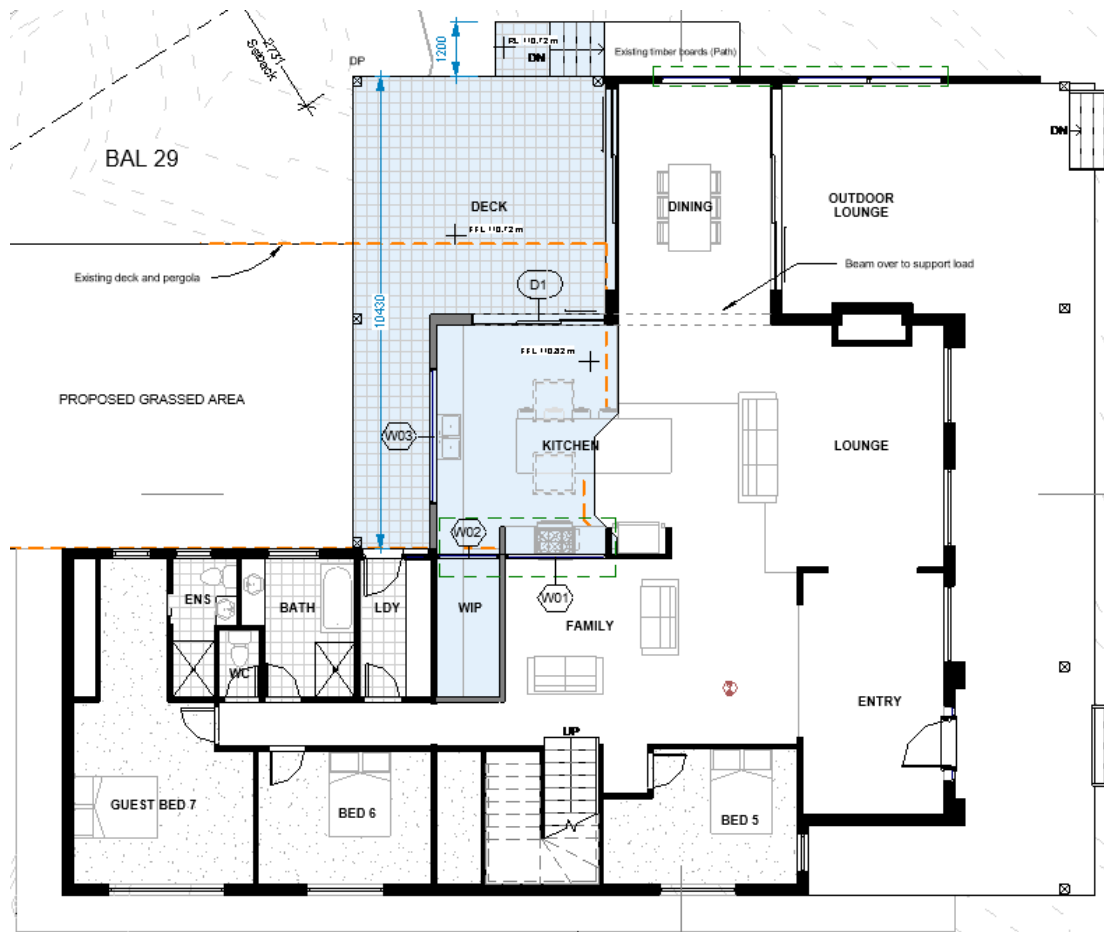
Ground Floor Plan (source Astute Architectural Drafting)
